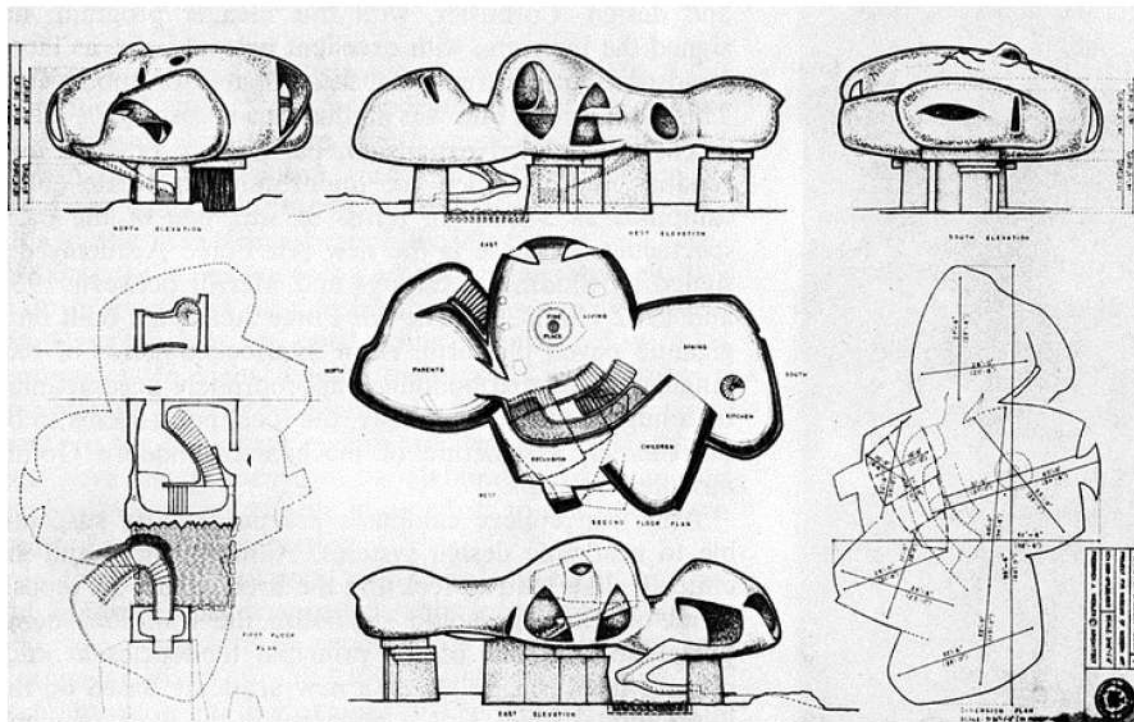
"Endless House" drawings, F. Kiesler, 1967 (Foundation, 2021)
